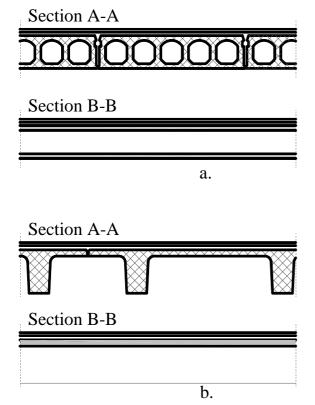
Intermediate floors using hollow core floor units and TT panels [1]
